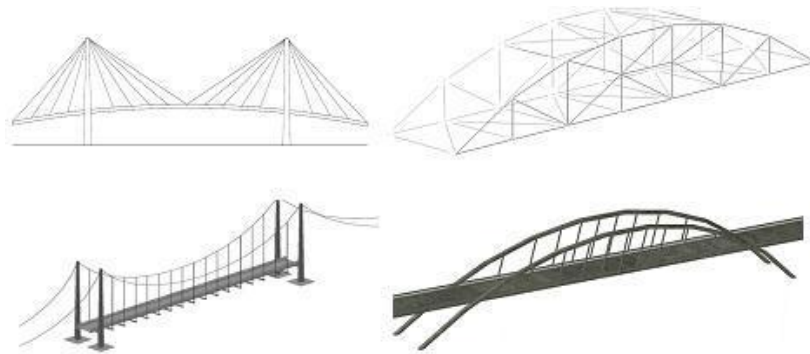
Pedestrian bridge options, clockwise from top left: stayed cable, truss bridge, arch bridge, and suspension bridge
